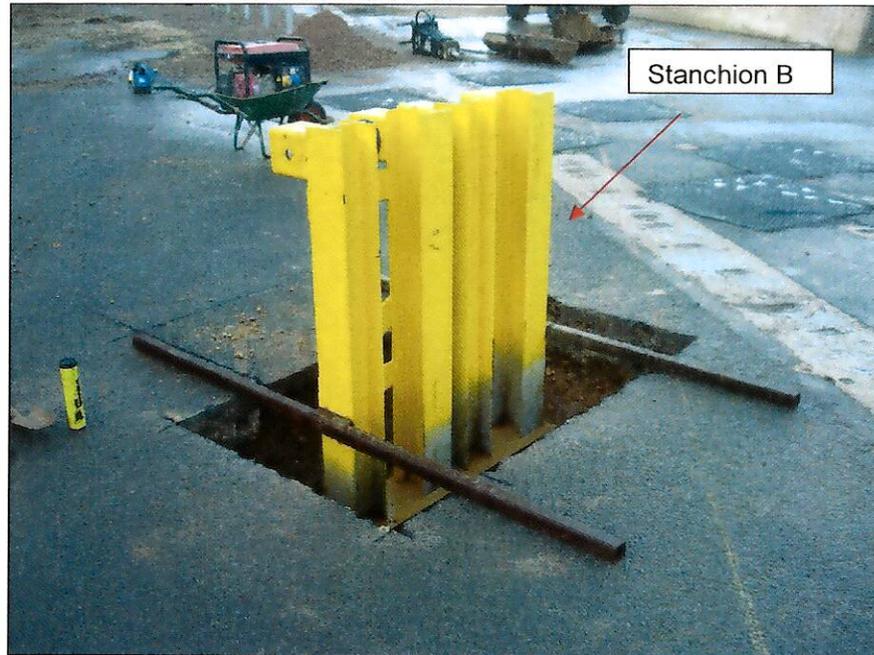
Repeat stage "b" and "c" for the second foundation post.
